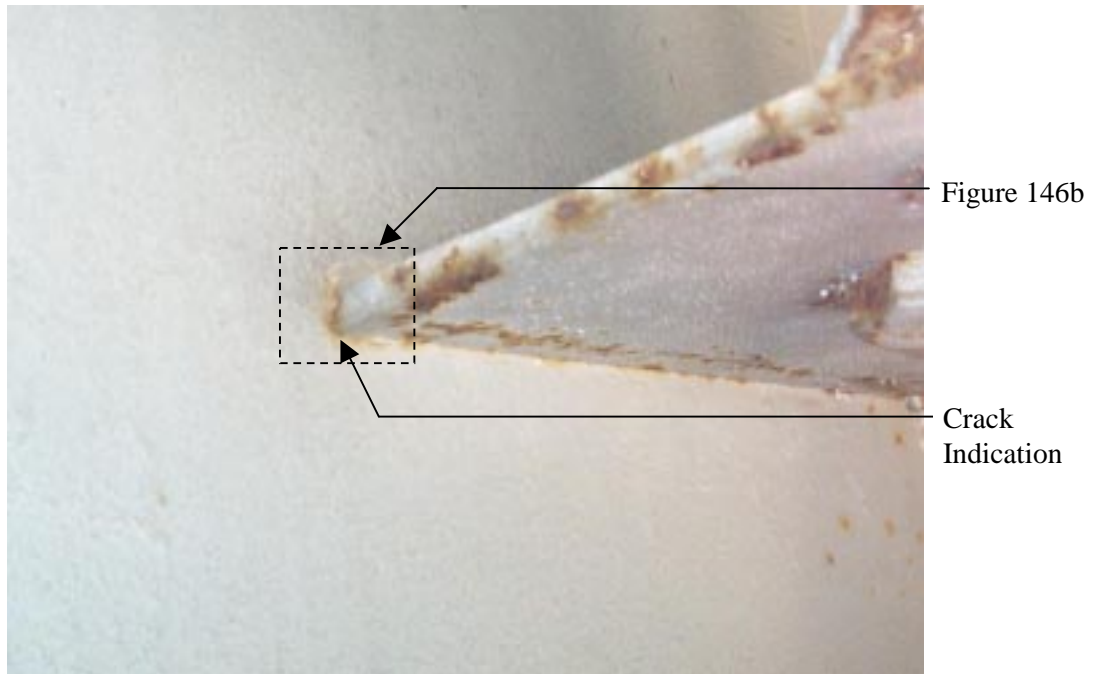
One-half of the lateral gusset plate-to-girder web and vertical stiffener inspection area.
